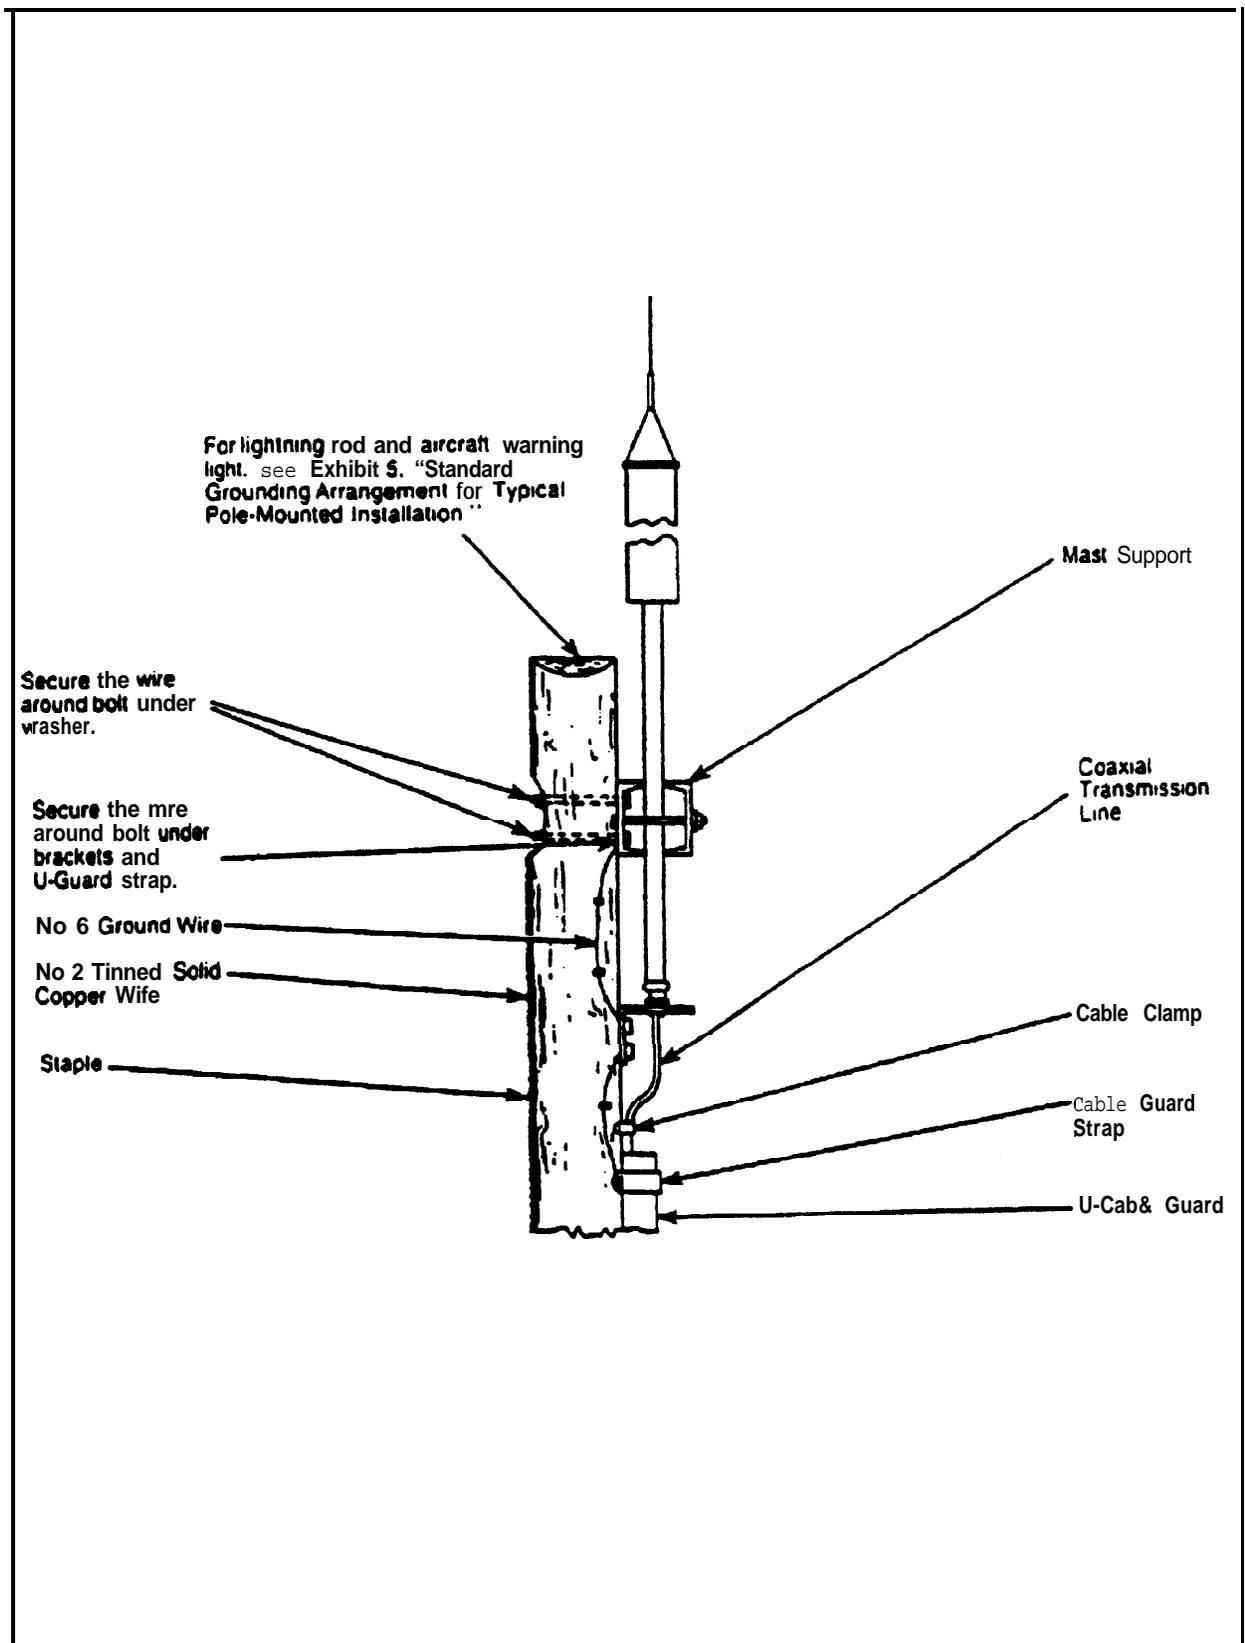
Antenna Grounding Details for Pole-Mounted Installation Sizes
